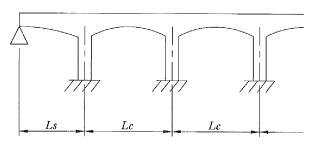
Characteristics of a Continuous Rigid Frame Box-Girder Bridge
